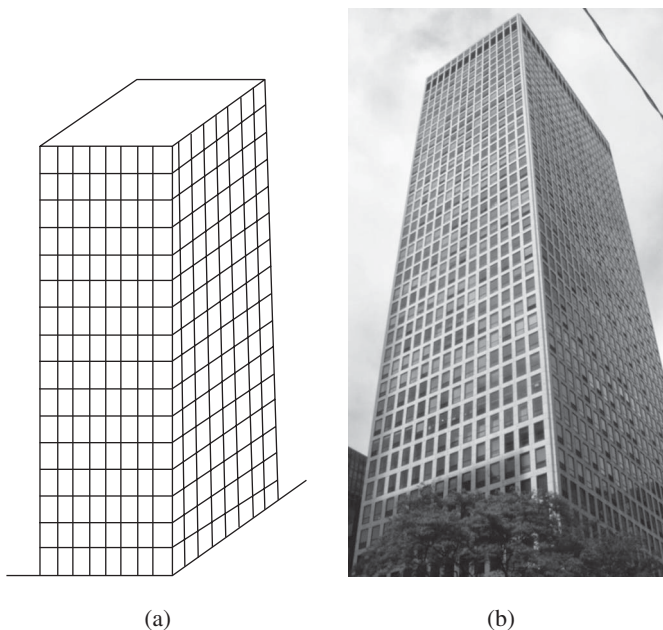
Framed-tube system (a) Typical framing (b) DeWitt-Chestnut apartment building in Chicago
